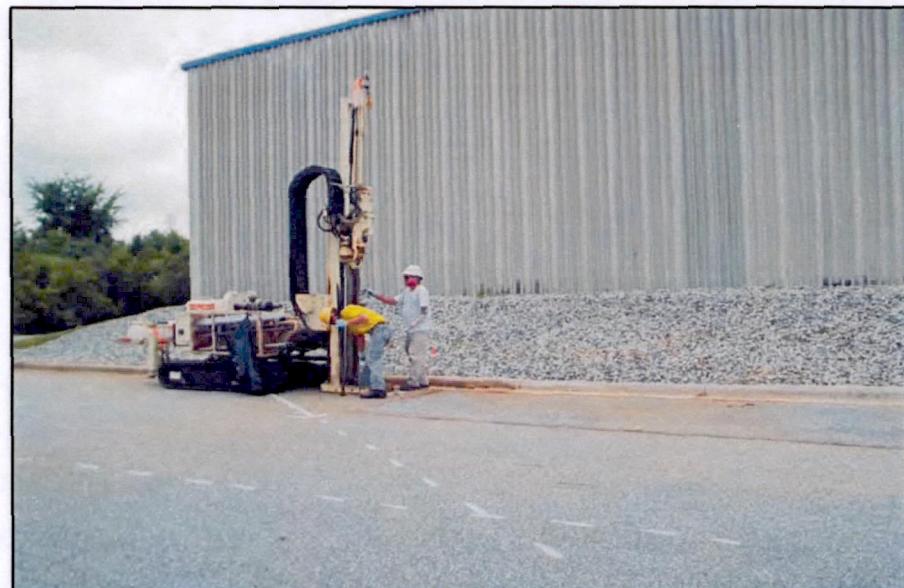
Looking west as WP-5 is installed adjacent to former remediation excavation area.
